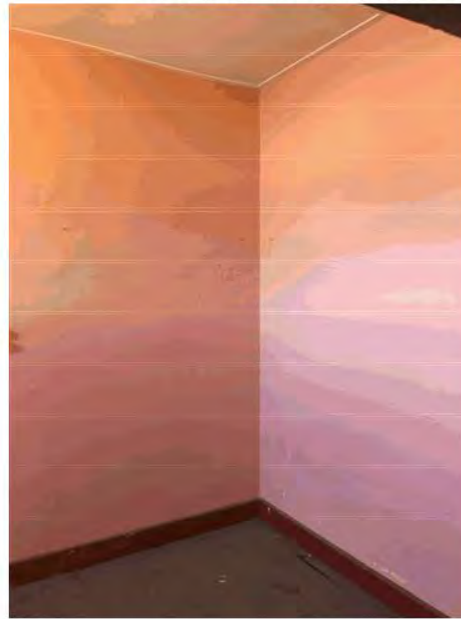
Condition of Bedroom 1 walls and skirtings.
